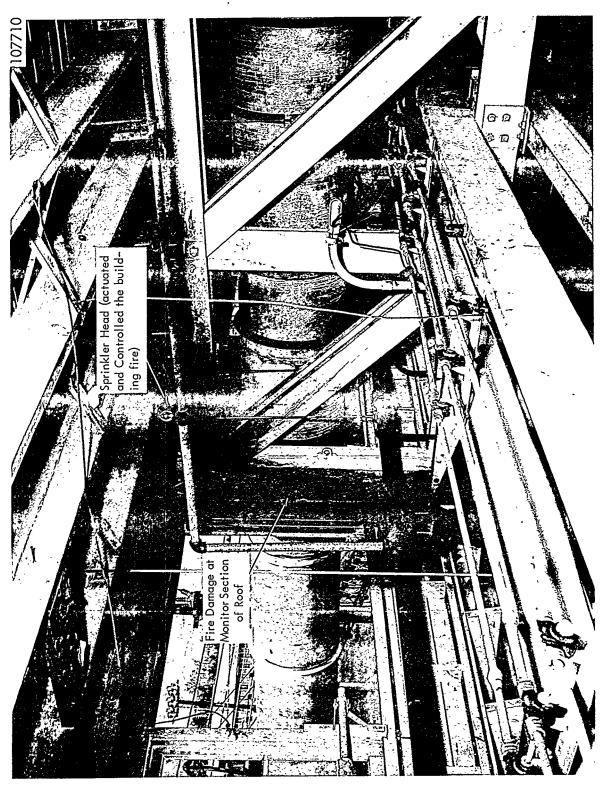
VIEW SHOWING VERTICAL TRAVEL OF THE FIRE AND THE LOCATION OF THE SPRINKLER HEAD.
